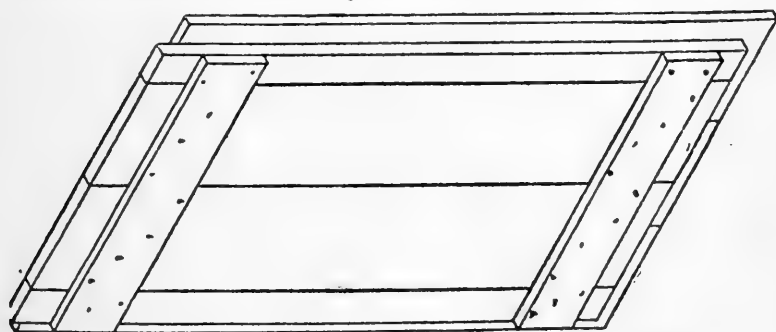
CONSTRUCTION OF DOOR OF HORIZONTAL GIRTSILO. (GULLEY.)
